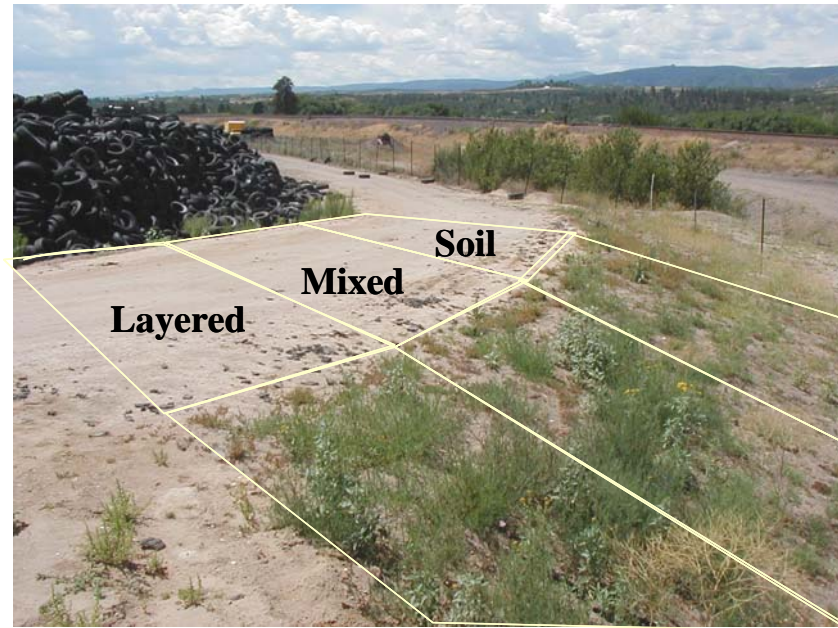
View of the West Slope of the Tire Shred-Soil Embankment
